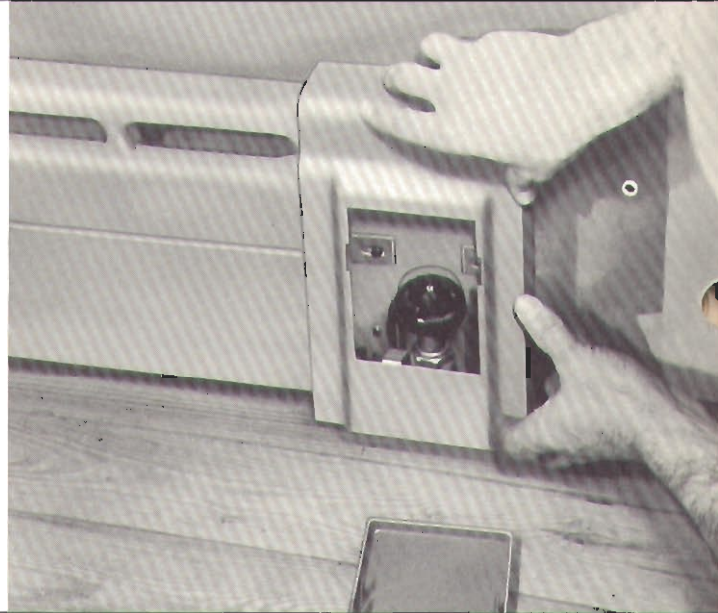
shows the installer sliding the valve enclosure onto the retaining bracket at the right-hand end of the assembly. The valve access door, for instant access to the valve, is quickly fitted into place and removed without tools. End boxes are installed in the same way. Note the use of the end bracket on the end of the panel inside the valve enclosure. Right and left hand end boxes and valve enclosures are available and should be so specified when ordering.
